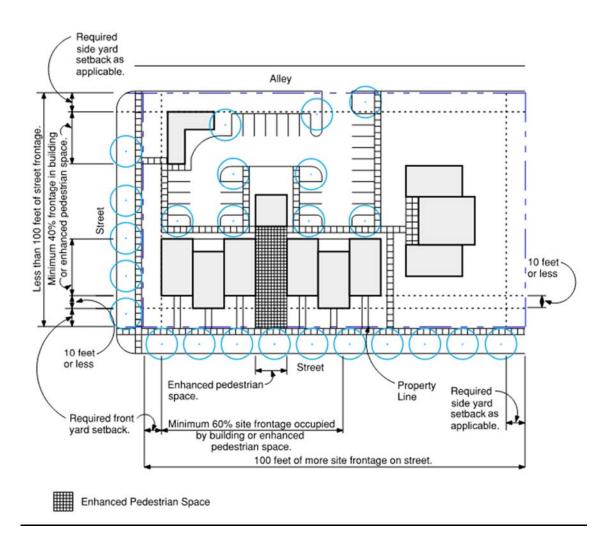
(2)(a) Multi-Unit Minimum Building Setback Along Streets
